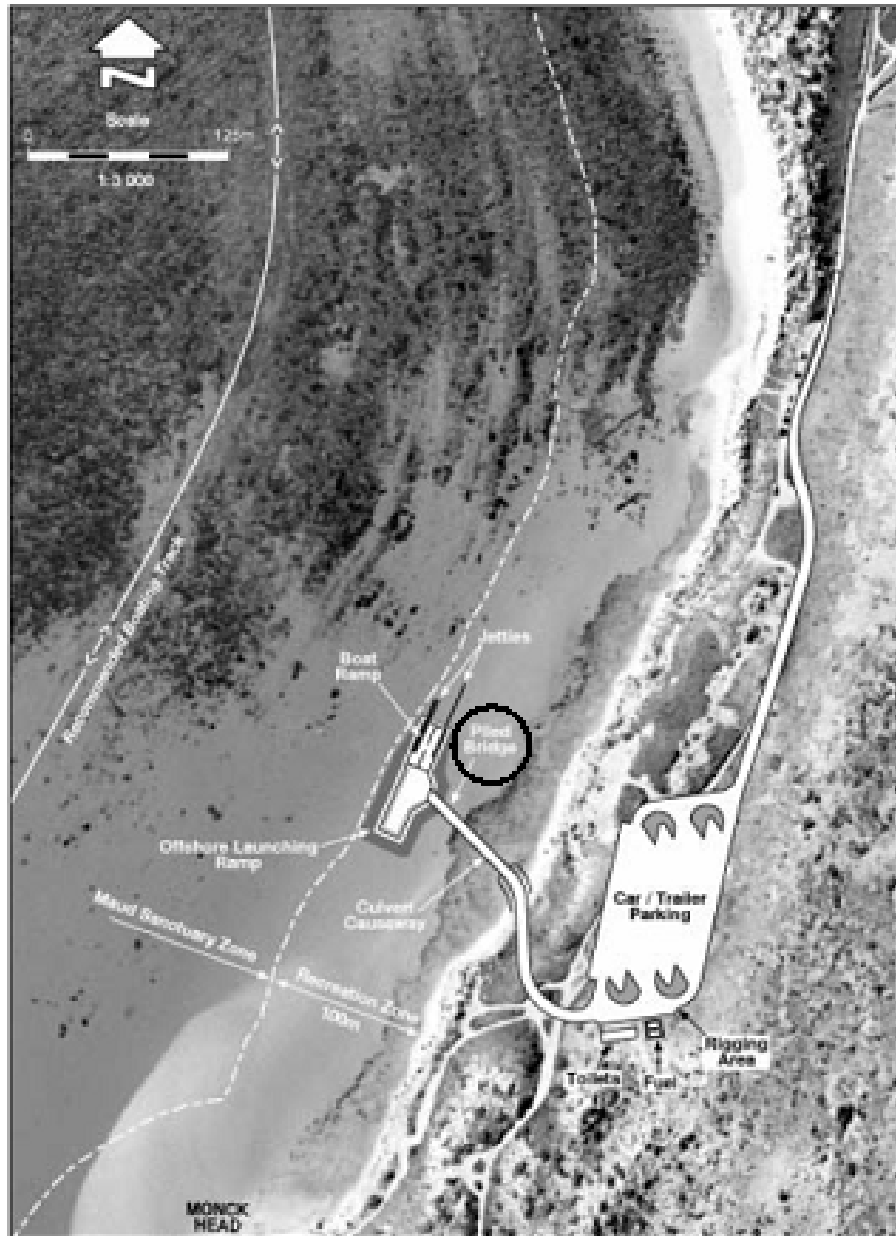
Construction Plan for the Monck Head Boat Launching Facility (Photos from Environmental Protection Authority, 2003)
